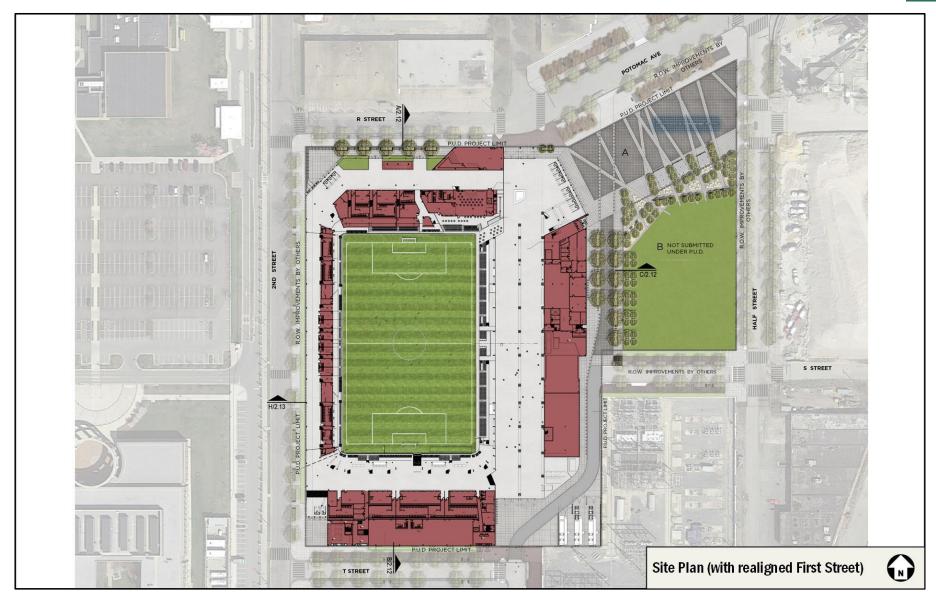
Site Plan (as of August 19, 2016 PUD submission – current First Street alignment with slight adjustments is shown in exhibits in the Technical Attachments)
